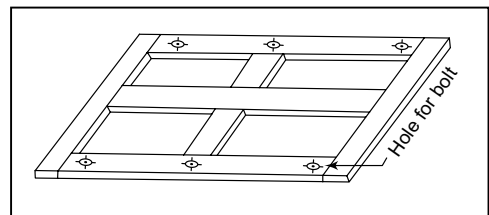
Wooden template for hanging foundation bolts while pouring concrete for foundation of a pumping set
